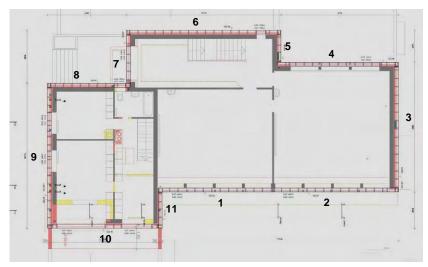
1st floor plan of school building with modules 1 – 11 (source: Renggli HolzbauWeise)
